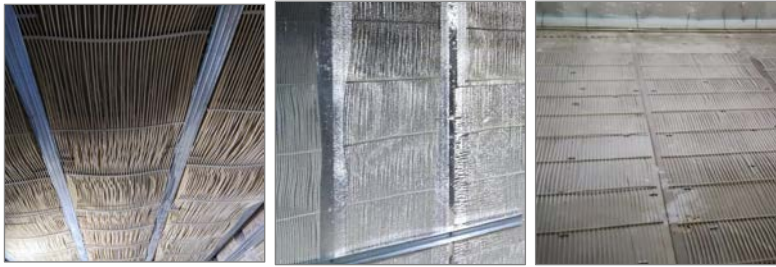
Capillary heat exchangers installed on the ceiling, walls and floor.
